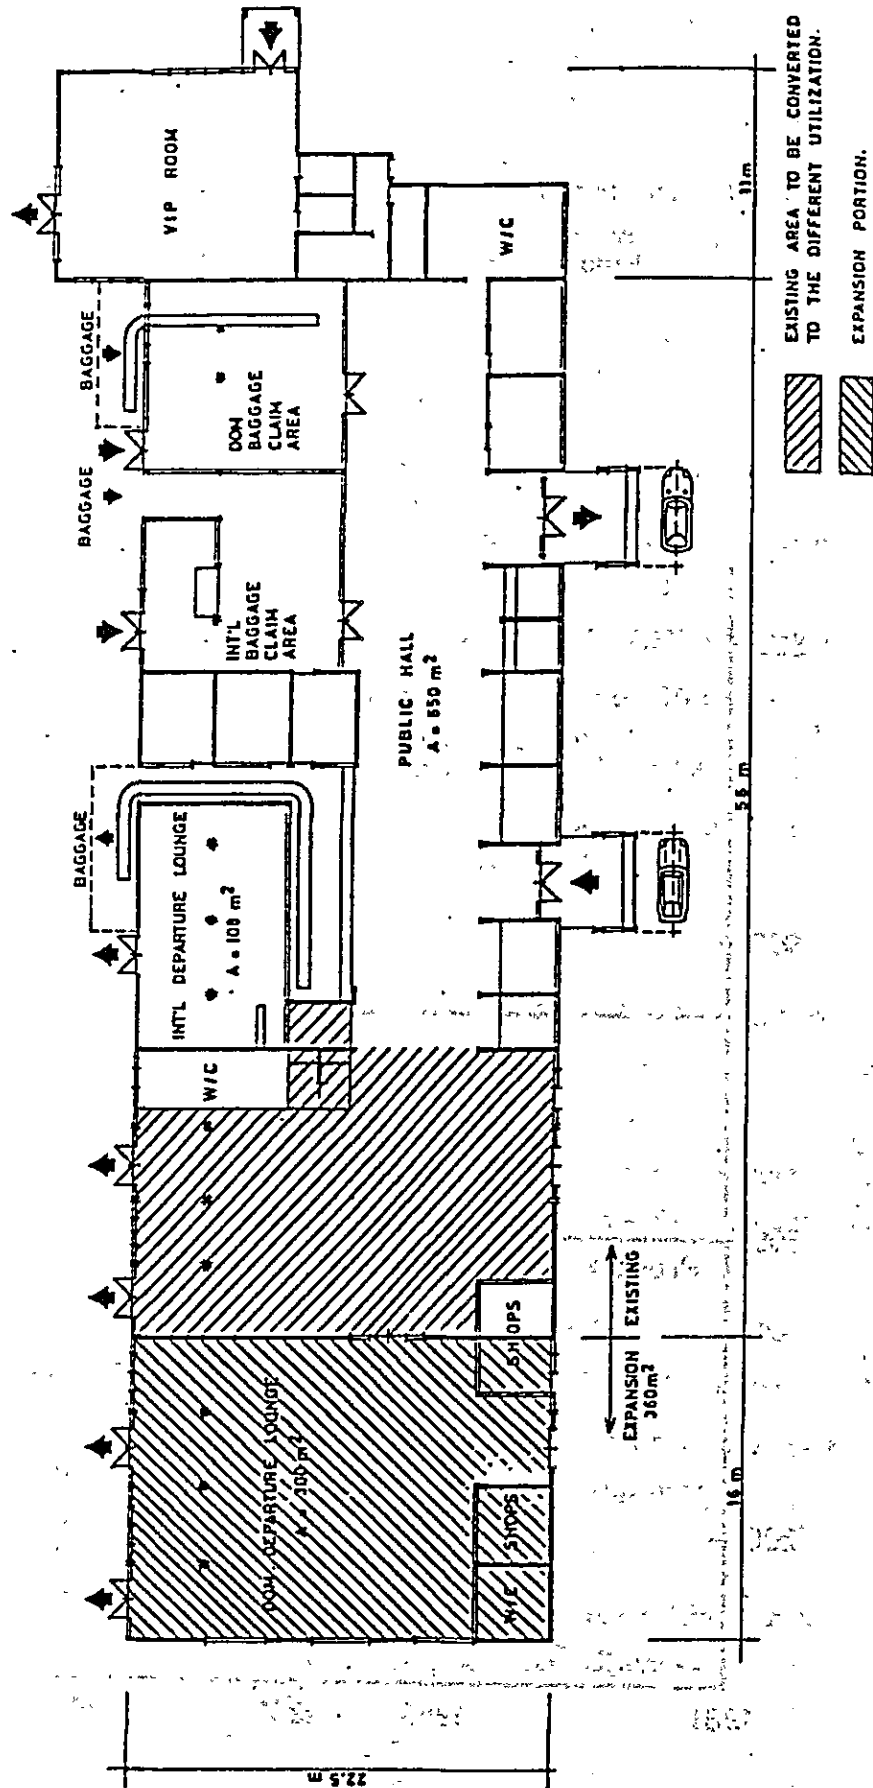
RENOVATION CONCEPT FOR THE EXISTING TERMINAL BUILDING
